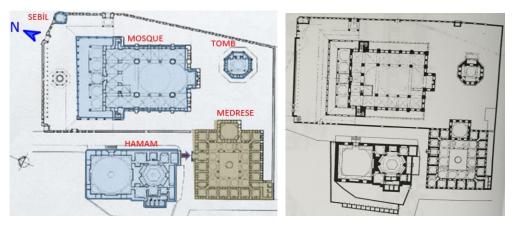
(left) Site Plan Restitution of the Complex (Kuran 1986) Figure 3.188. (right) Site Plan Restitution of the Complex by Ali Sami Ülgen, 1941
